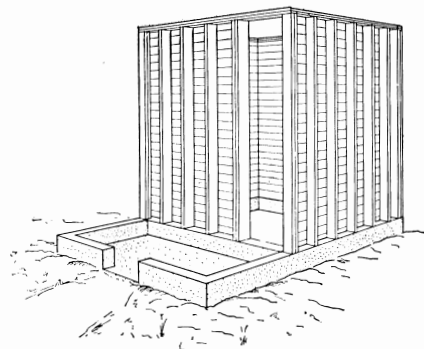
SECOND STAGE IN CONSTRUCTING THE ICE HOUSE
